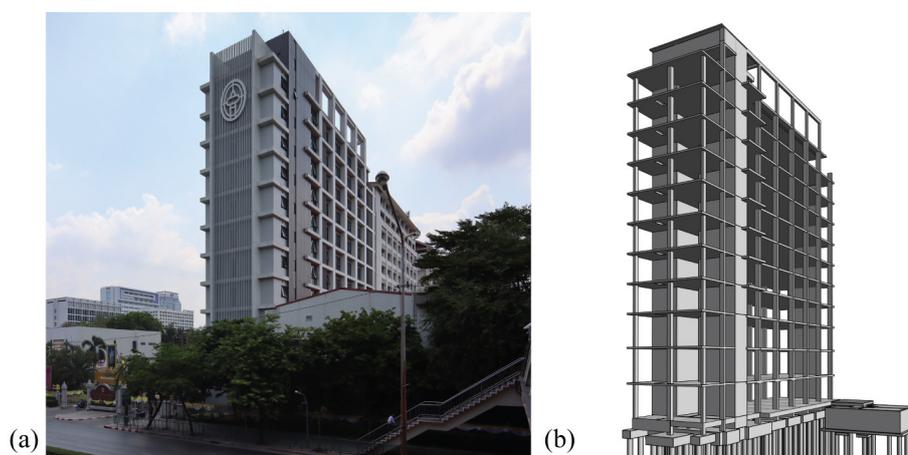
(a) The case study building, which is the new building of the Faculty of Architecture, Chulalongkorn University, Bangkok, Thailand. (b) The structural BIM model of the case study building.
